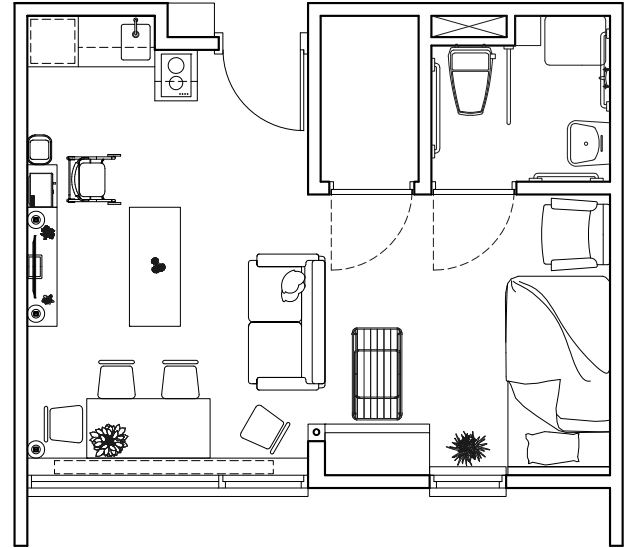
Floor plan of the room #01 (illustrated by author)
